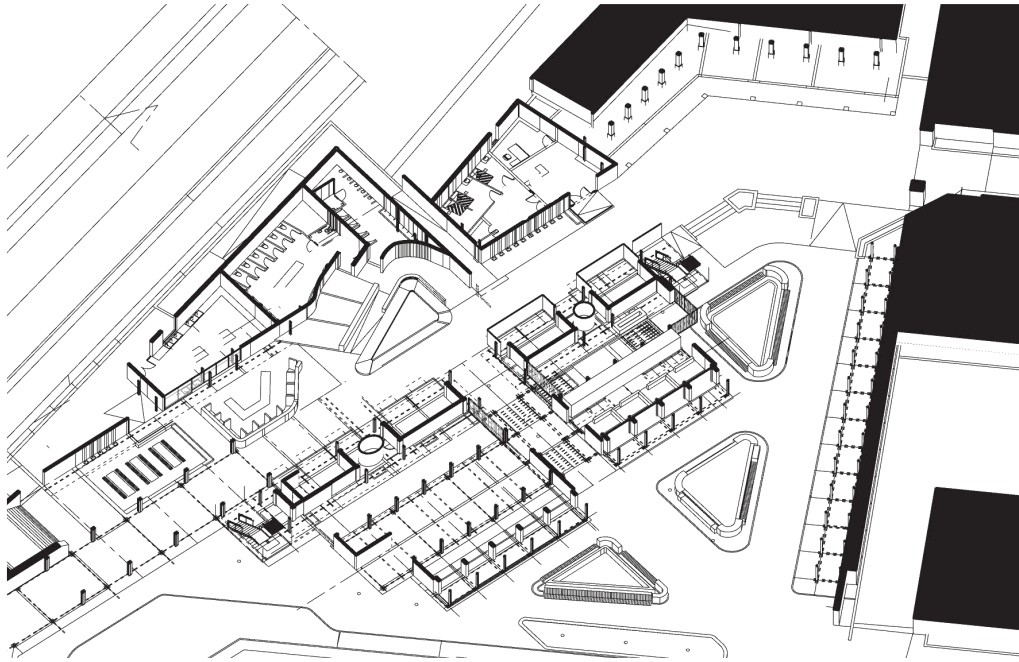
Plan Axo of the ground floor (Nemasetoni 2021)
